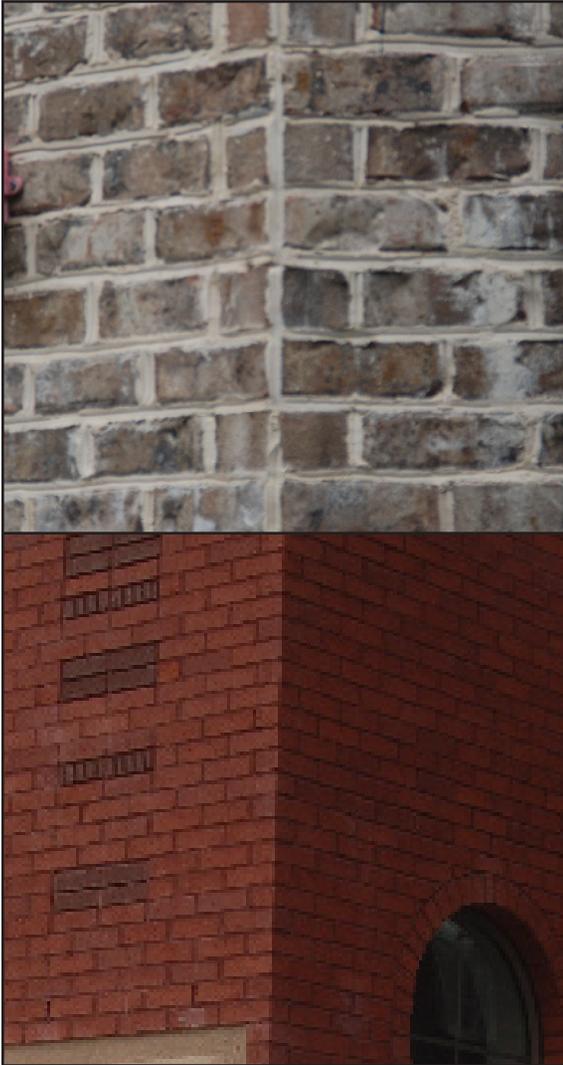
This condominium in Atlanta, GA uses EIFS (Exterior Insulation Finishing System) made to look like brick. Such systems are constructed using panels which create joints that would not be found in traditional masonry. In this example (above) the “bricks” form a joint at the corner instead of wrapping around as they should (below).
